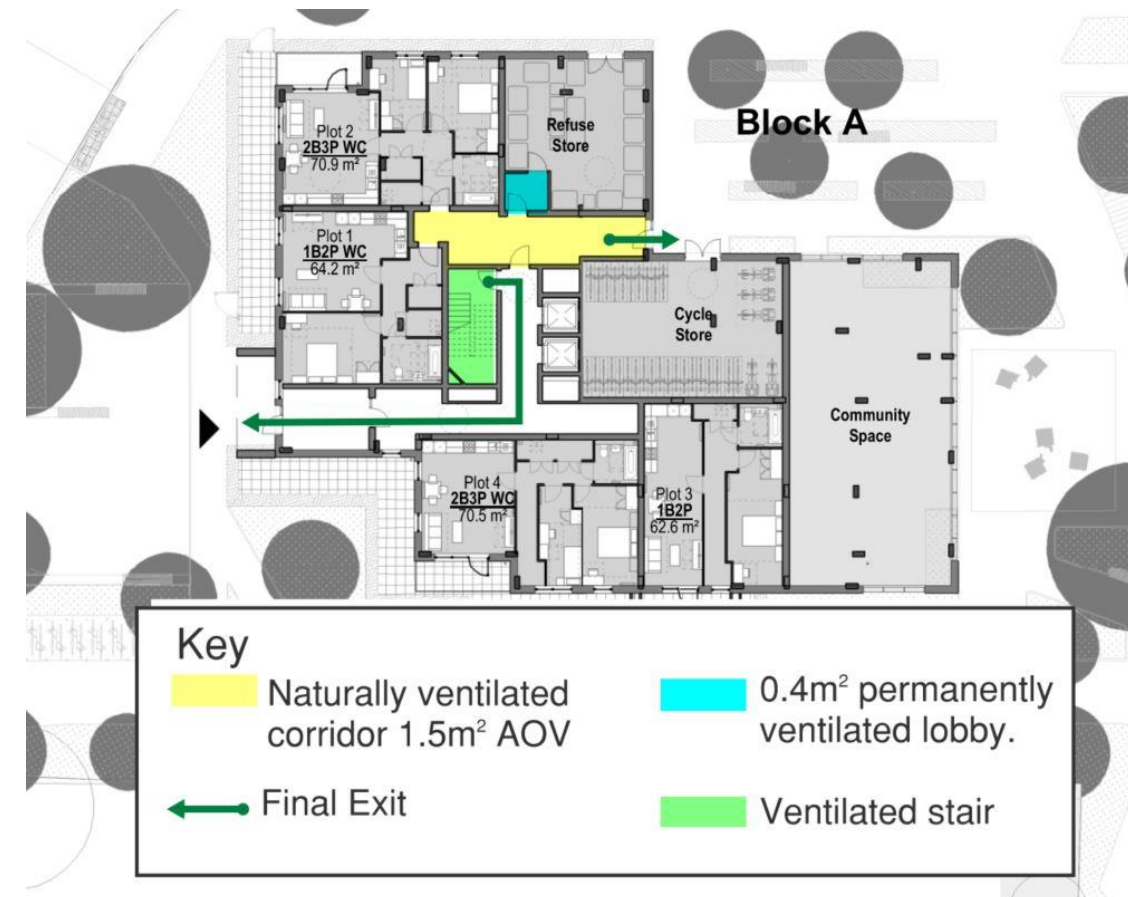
Means of escape from stair direct to outside via protected exit passageway - Block A
